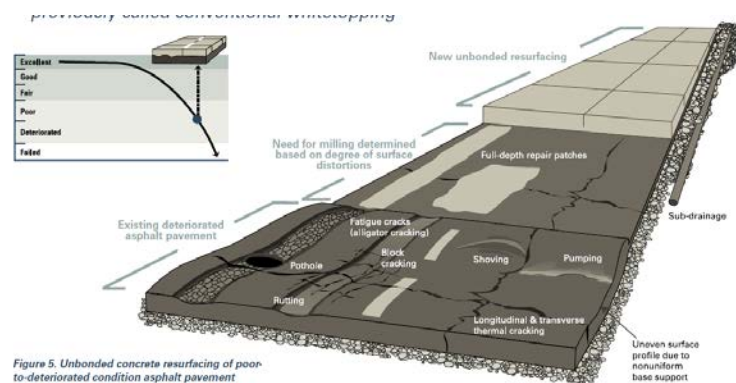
Unbonded concrete resurfacing of asphalt pavement (Harrington et al. 2007)
